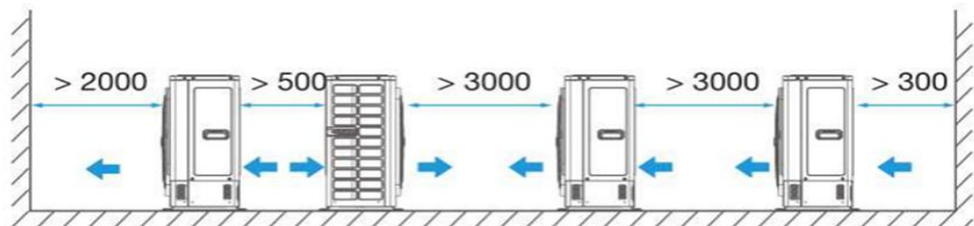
Multiple unit installation side view (unit: mm)
